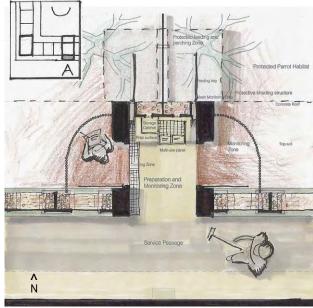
Plan of the Preparation and Monitoring Zone, Service Passage. (See section 7, drawing A).
